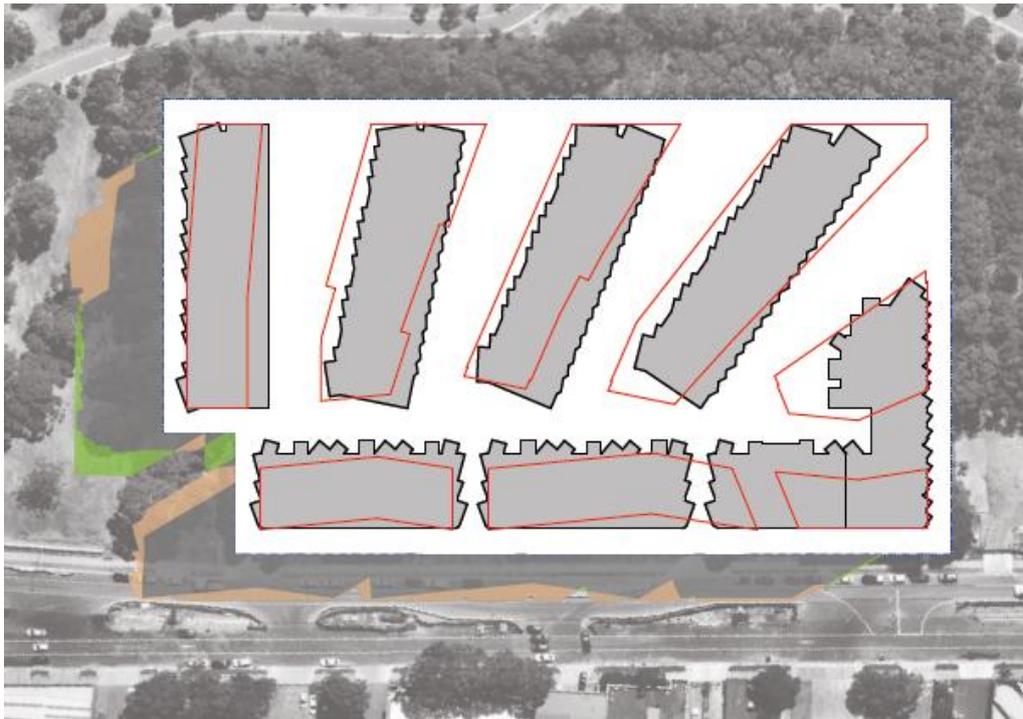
Shadow diagram at 12pm. Orange shows additional shadow and green shows shadow reduction. This plan does not include balconies, pergolas or additional structures.
